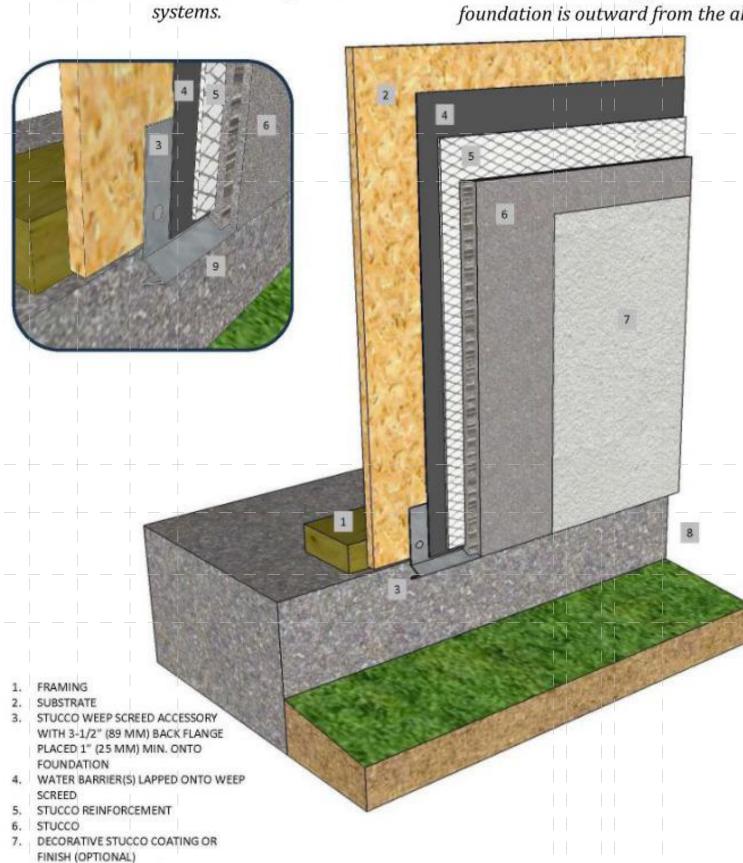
Typical foundation detail showing the cement plaster terminating with a V-style weep screed.
